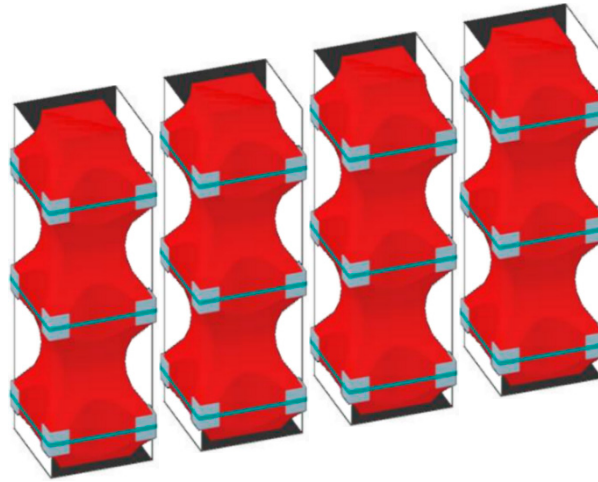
How the design criteria of the CAM system divide a masonry wall into juxtaposed confined columns to calculate the number of horizontal straps.
